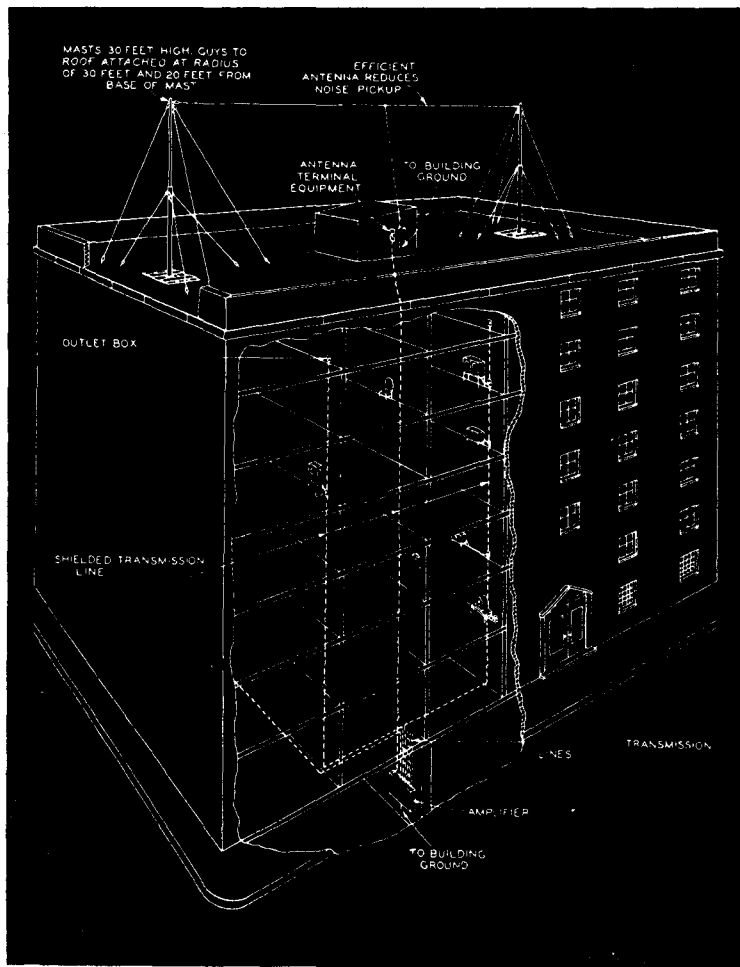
Substantial antenna construction suitable for apartment house, school or hotel.
